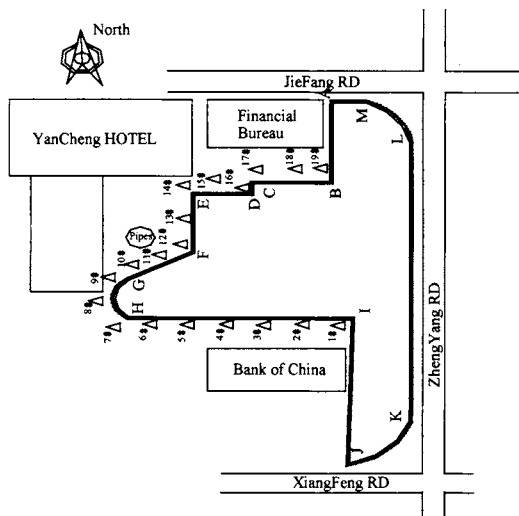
Sketch of foundation's plan view and the layout of the inspect points
